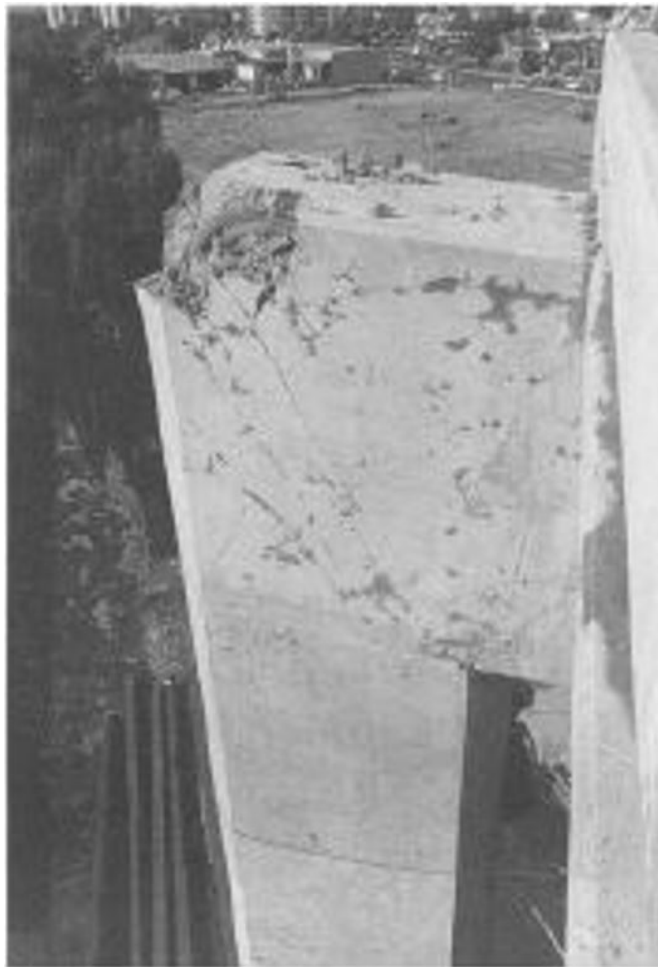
Knee-joint shear failure of connector damaged in the Loma Prieta earthquake (Priestley et al., 1996).
